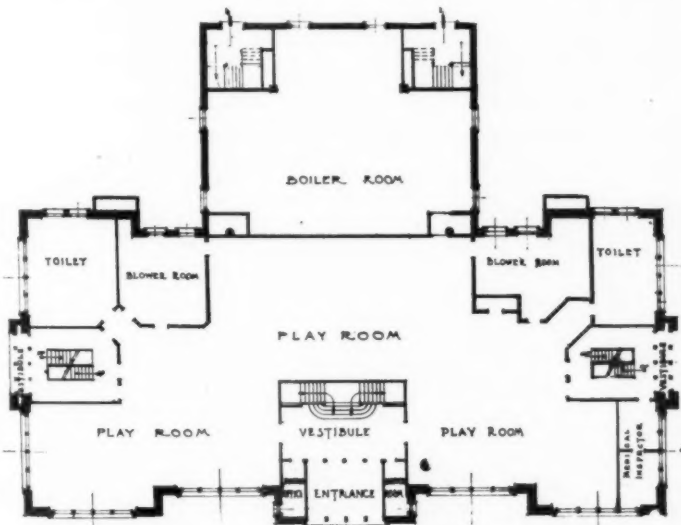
FIRST FLOOR PLAN. TYPE "C" ELEMENTARY SCHOOL
